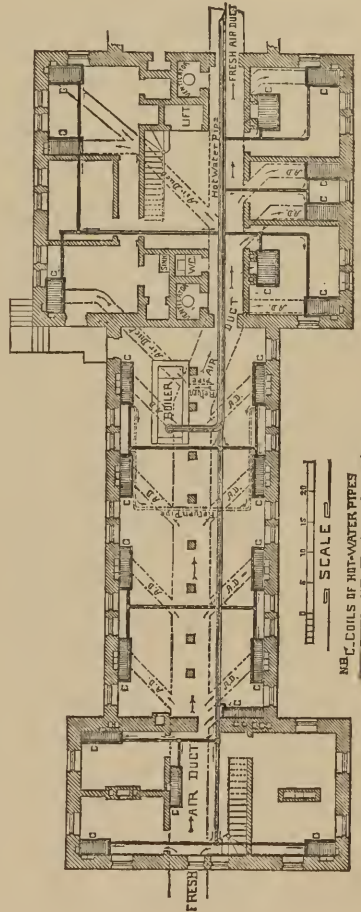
BARNES HOSPITAL. PLAN OF BASEMENT, WITH FRESH-AIR DUCTS AND HEATING APPARATUS.
